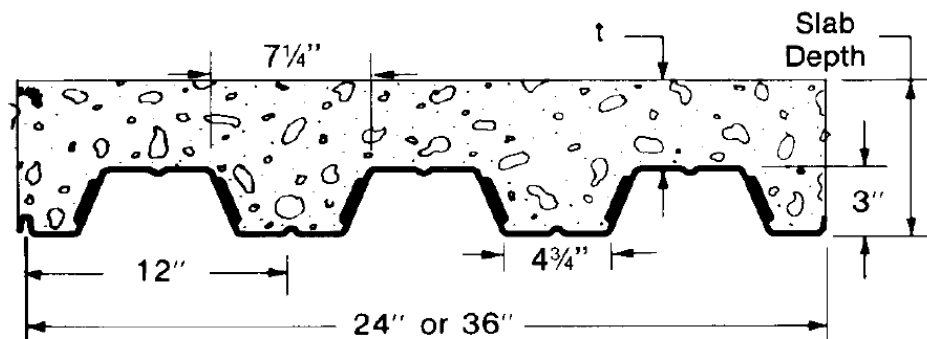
Fluted Deck. Reprinted from Vulcraft Steel Roof and Floor Deck Catalog, 2001. Used with permission.
